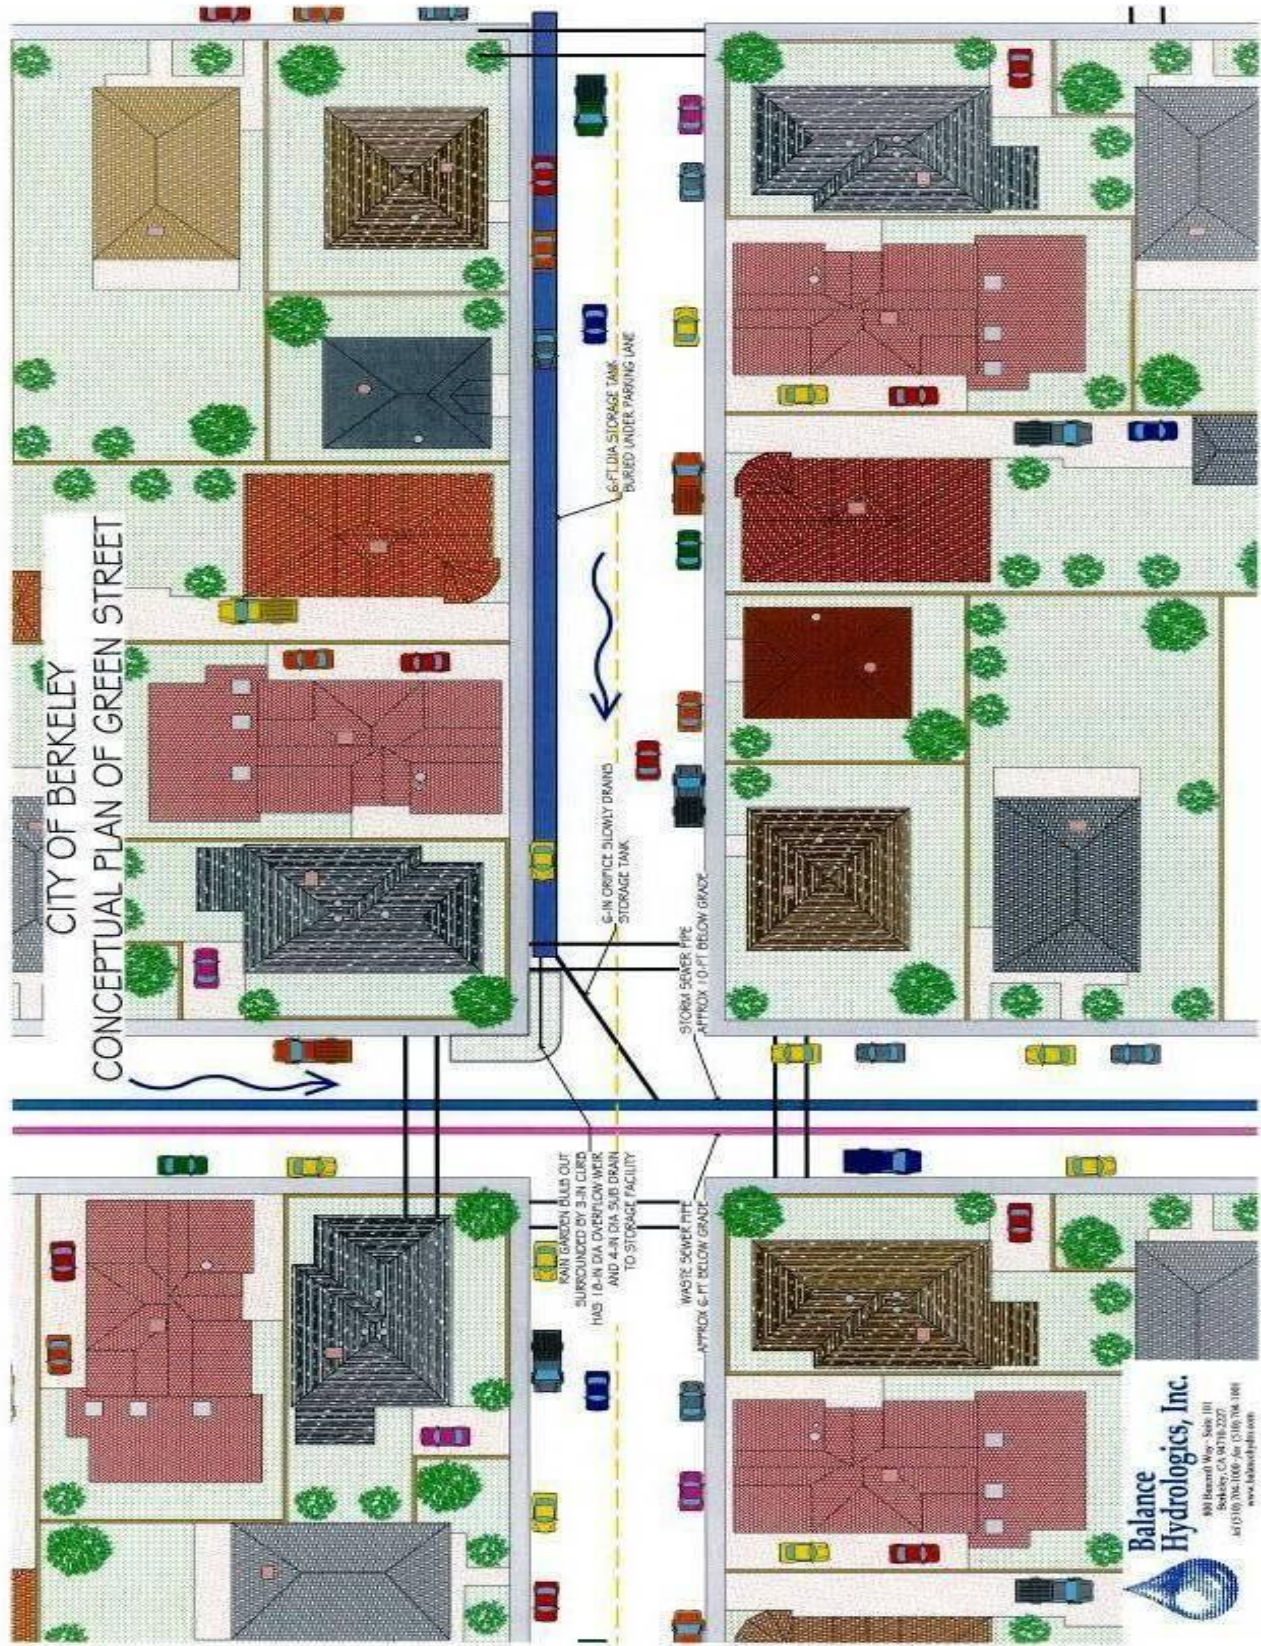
, Conceptual Plan View of Typical Green Infrastructure
